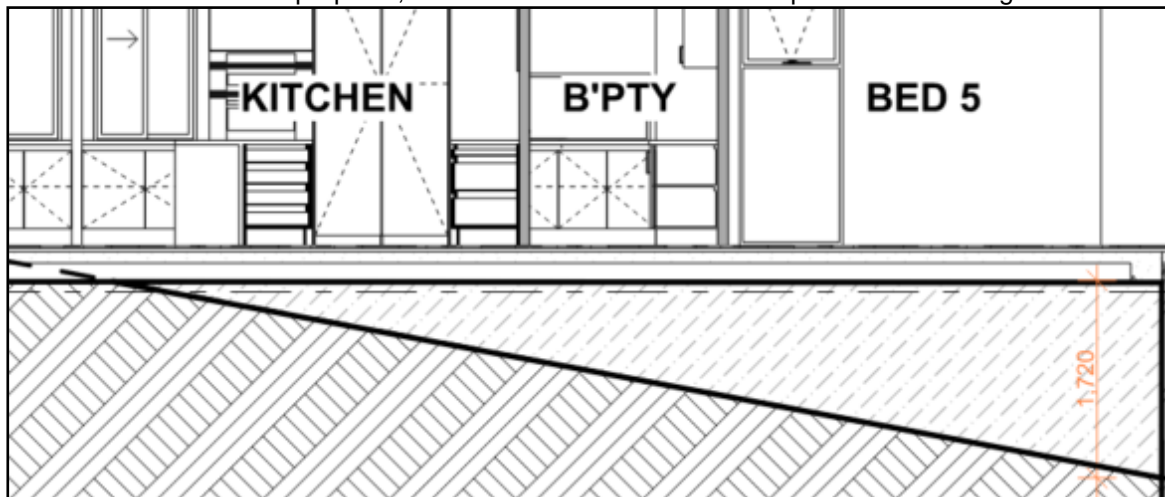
Maximum fill required to facilitate the first floor level (Source: Prime Design)
